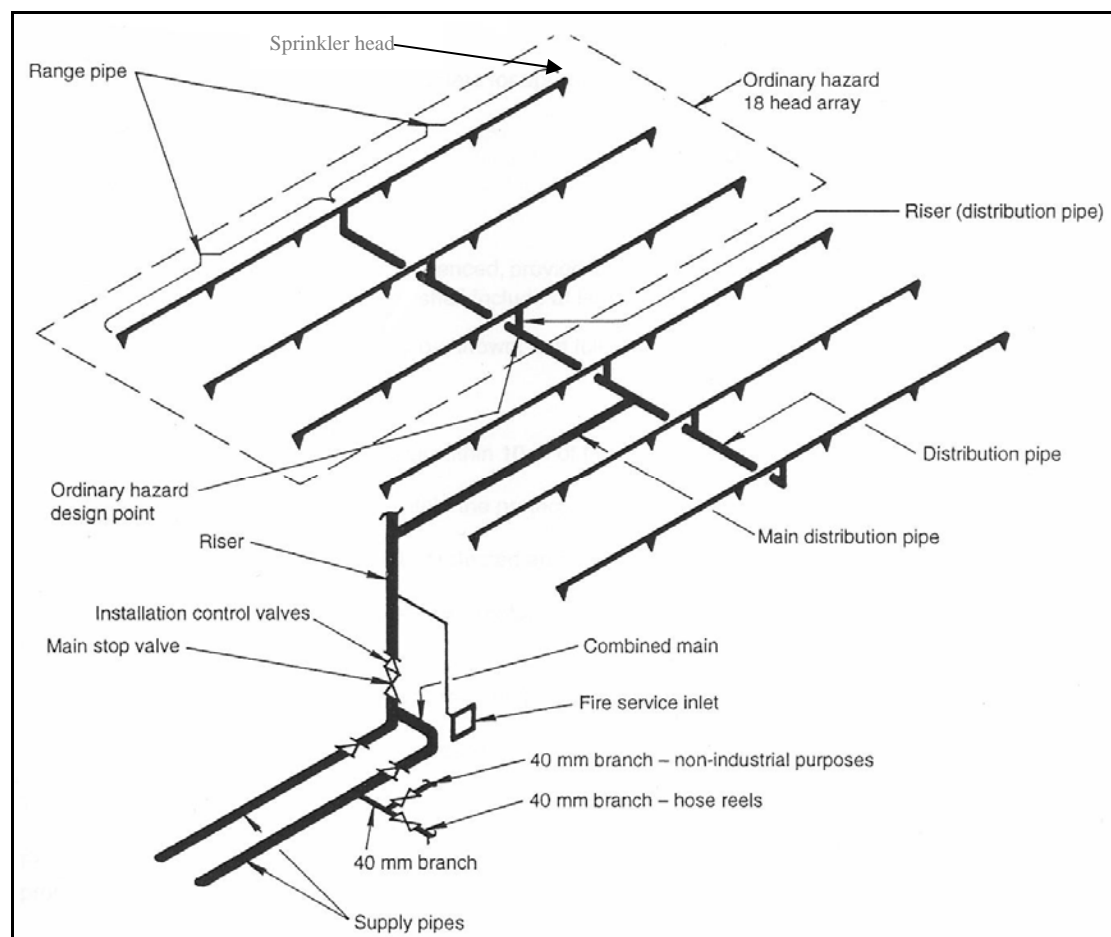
Typical layout of a sprinkler system (Standards New Zealand 2003)
